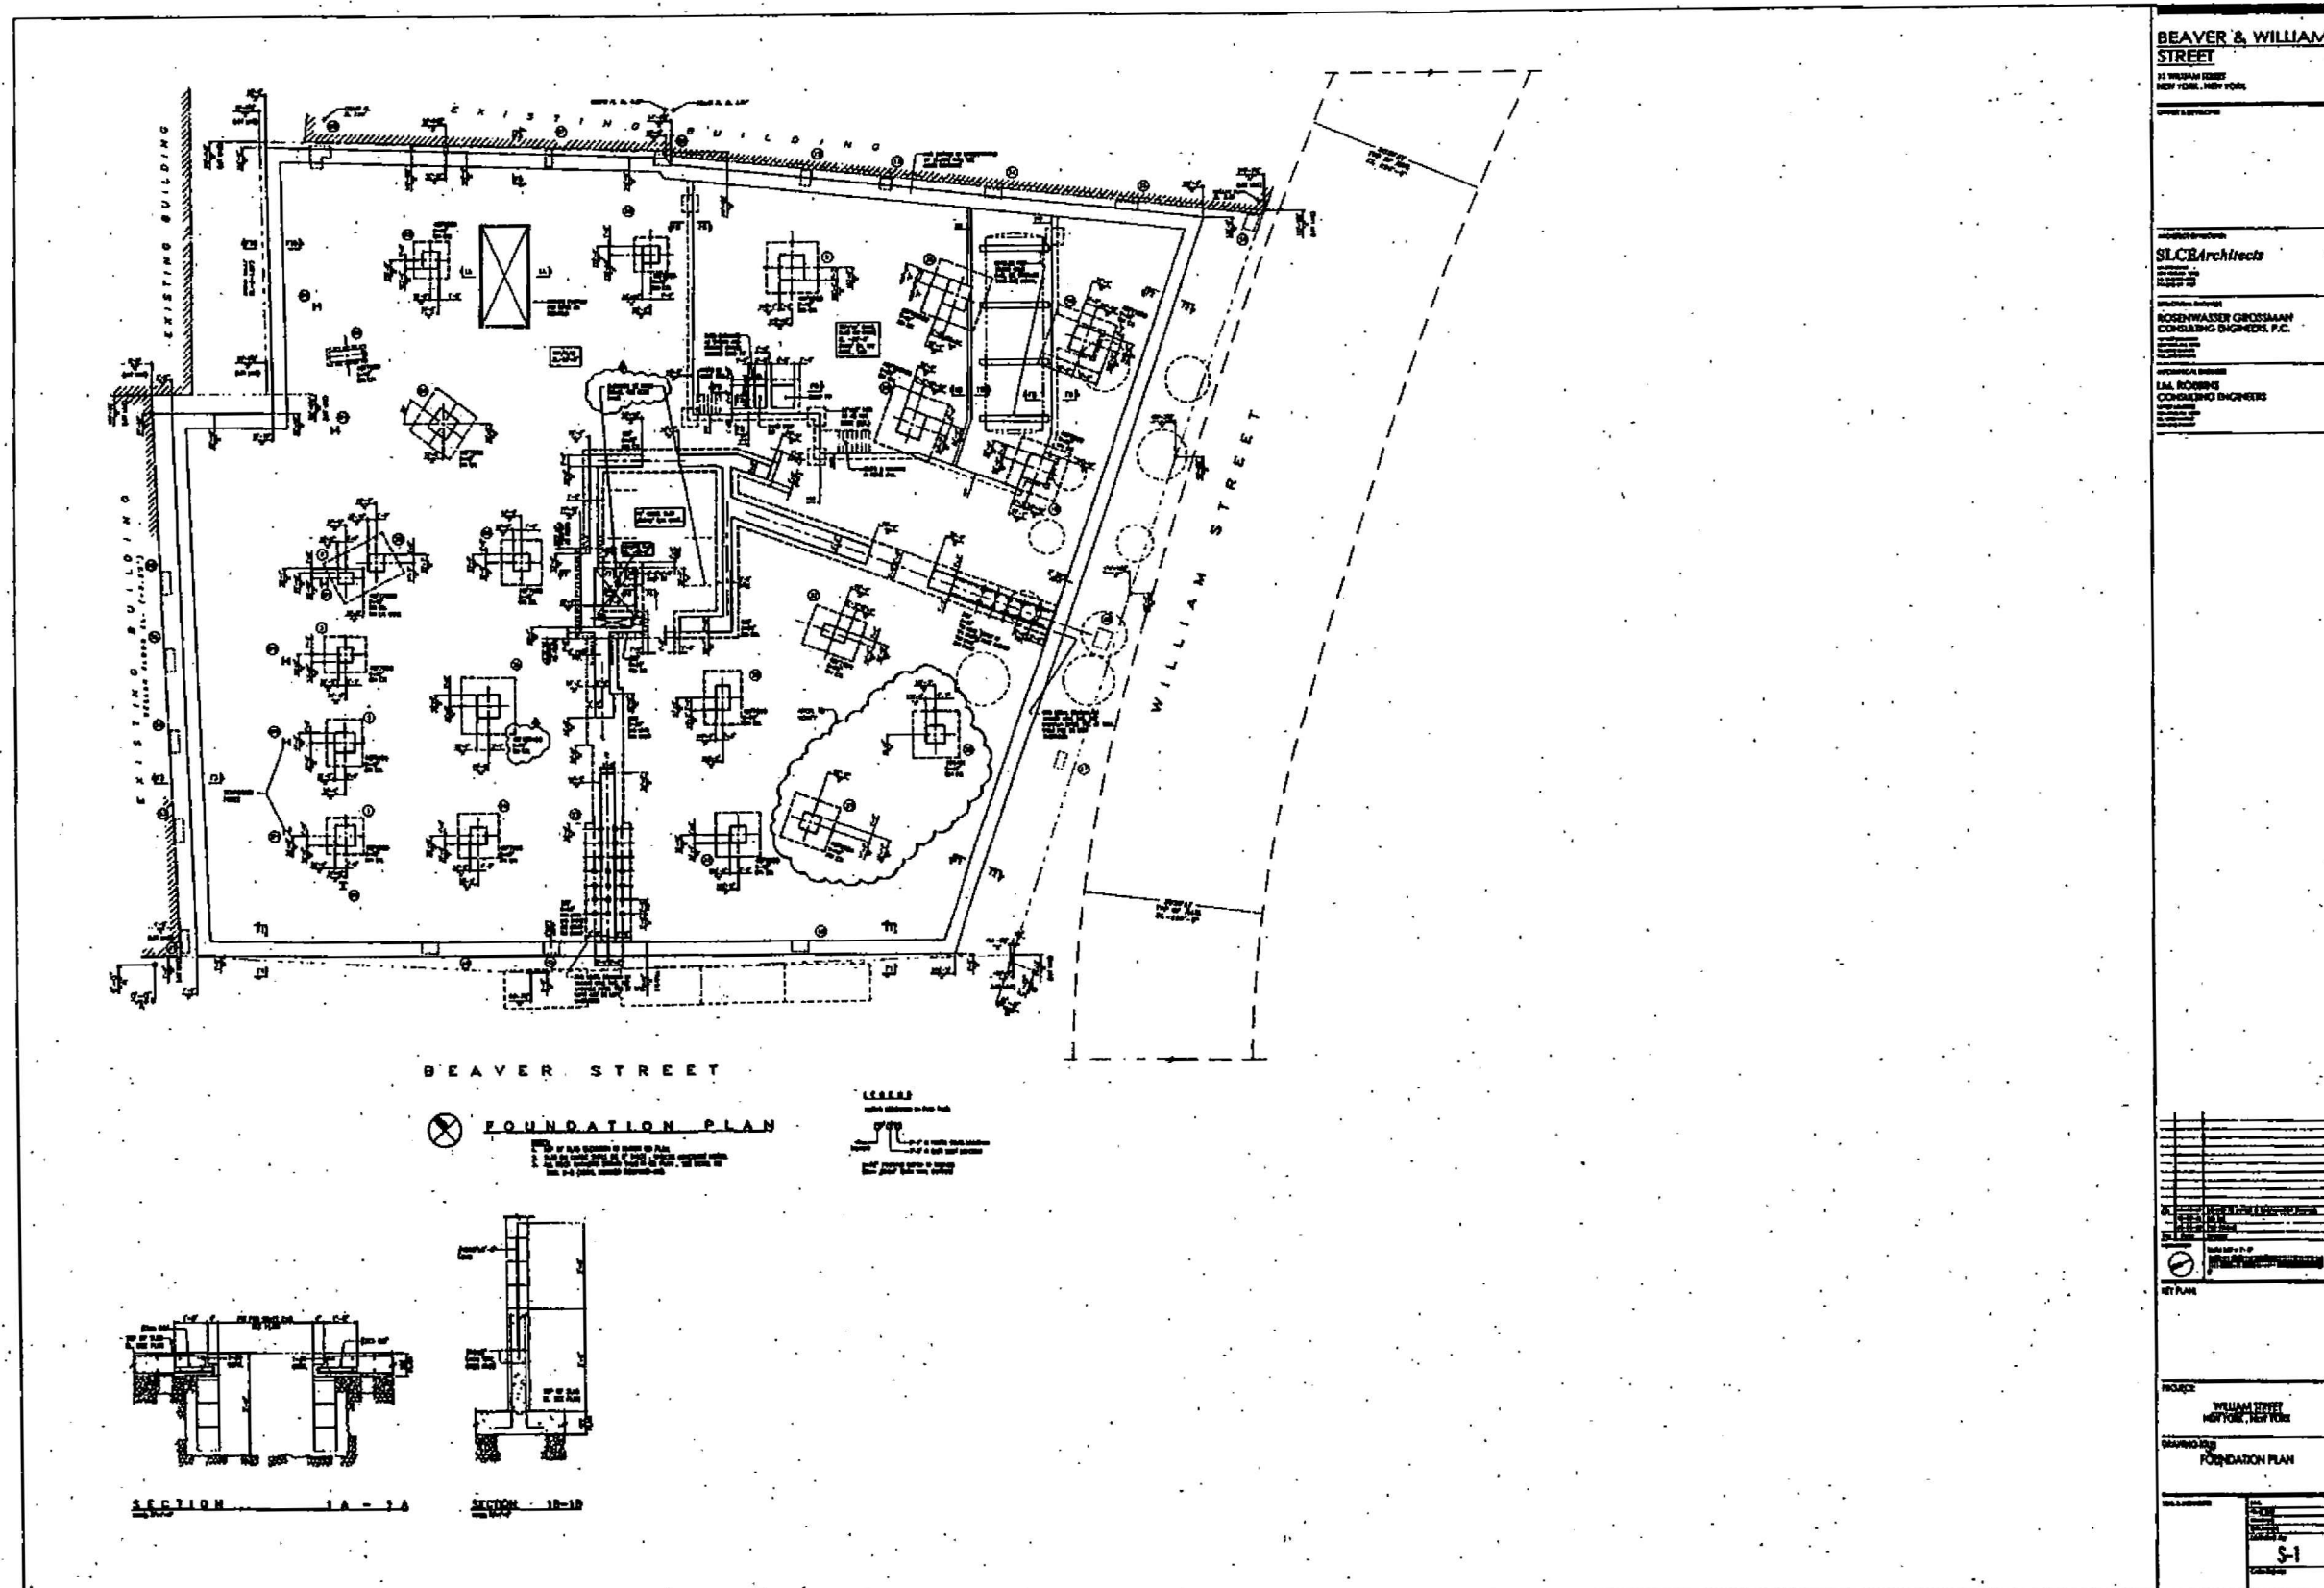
Location of Perimeter Excavation Trench for secant pilings. Elevations of depth of pre-excitation work (Elevations in relation to Manhattan datum). (SLCE Architects, 4/14/05)
